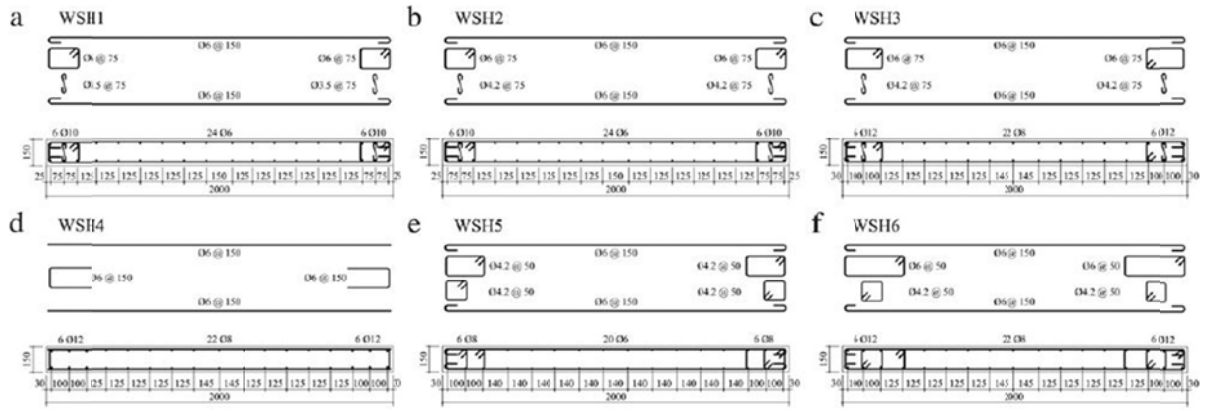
Reinforcement details of Dazio et al. (2009)
